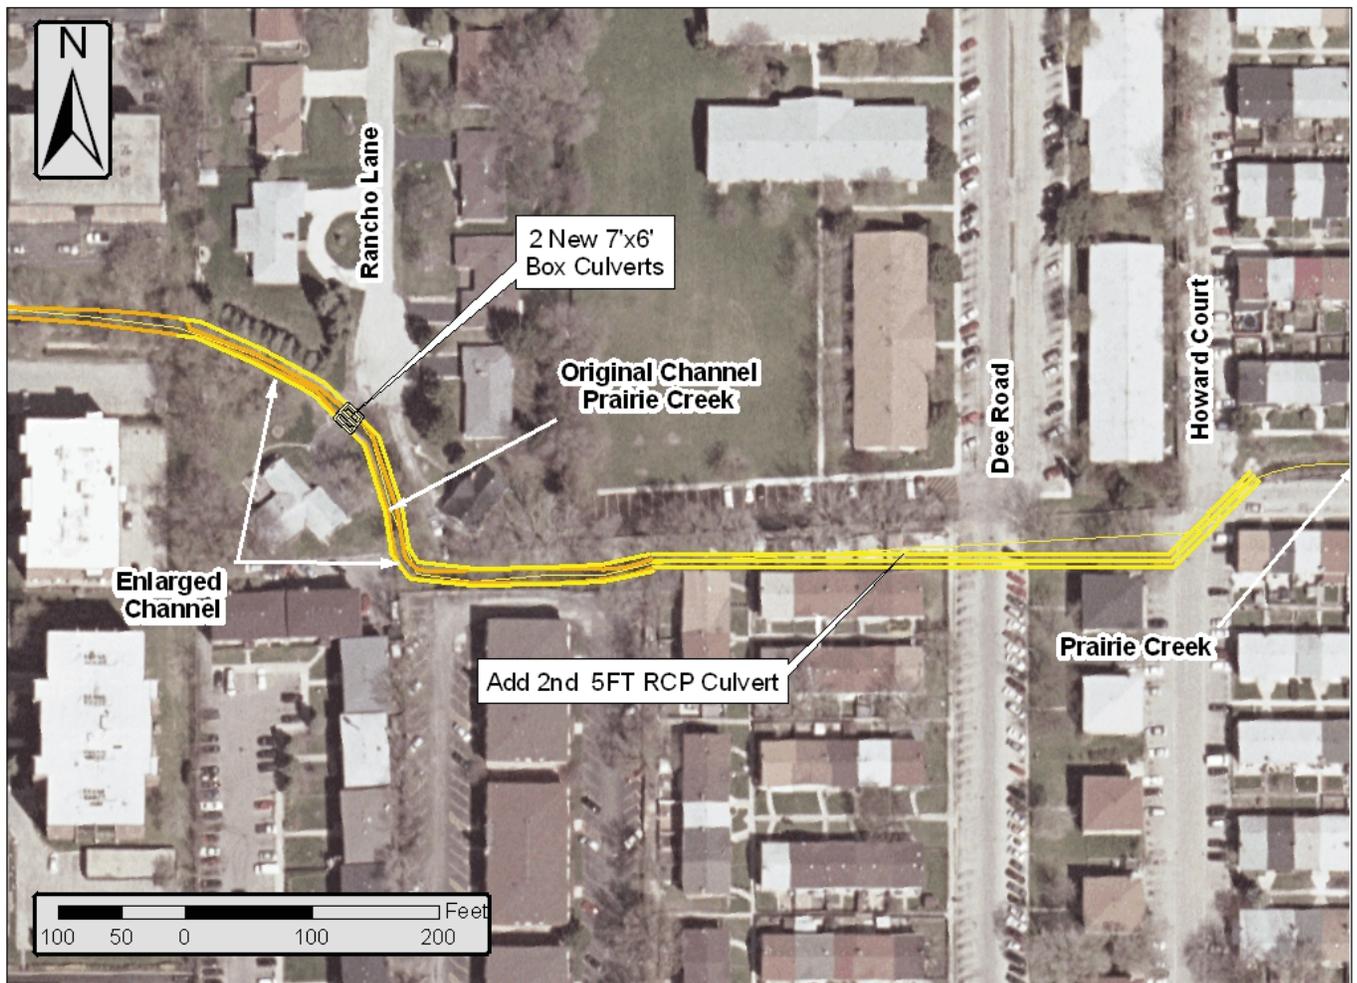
Alternative C6 - Replace Rancho Lane Culverts
